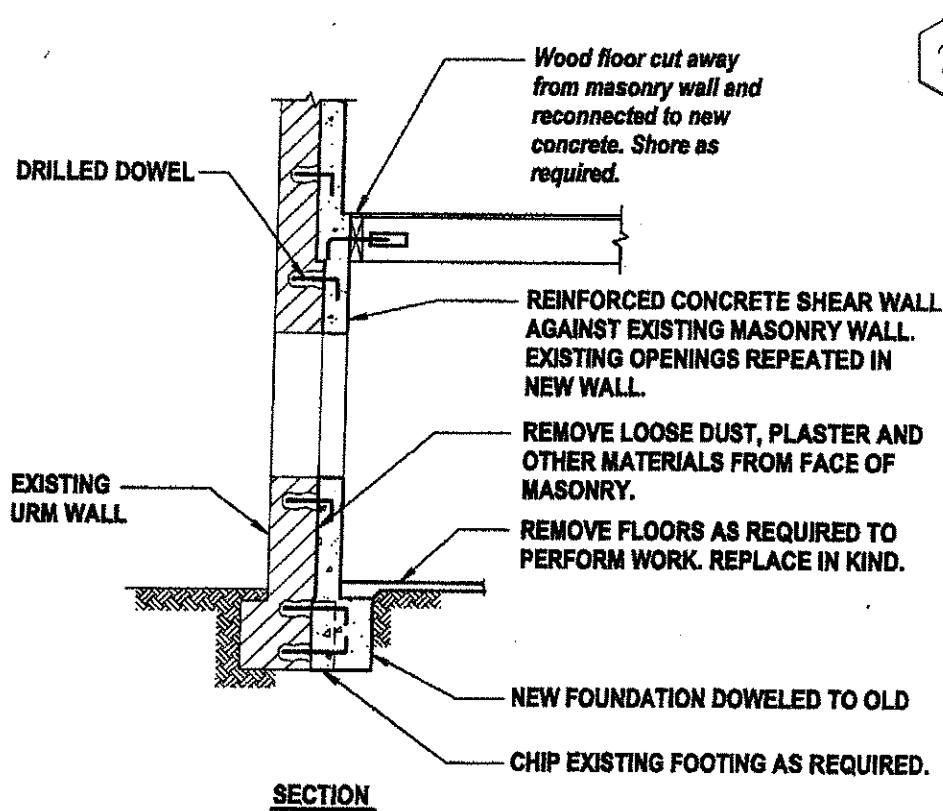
Concrete or Shotcrete Wall Overlay
